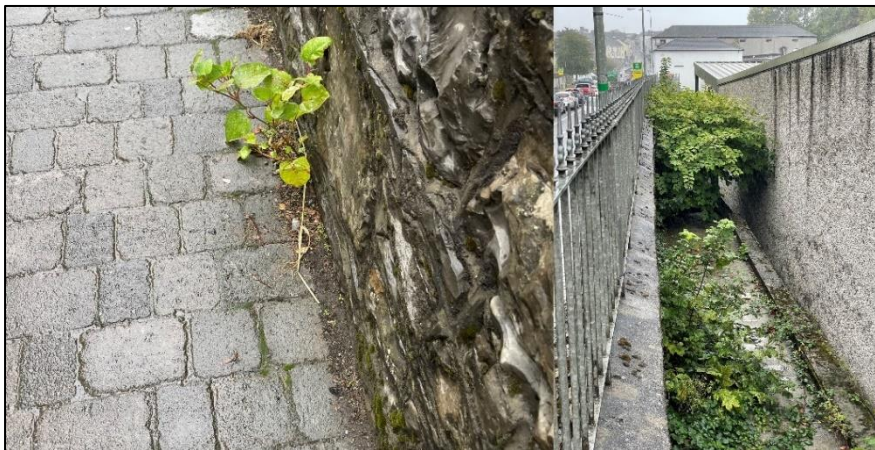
Population of Japanese Knotweed undermining wall at fore of buildings
